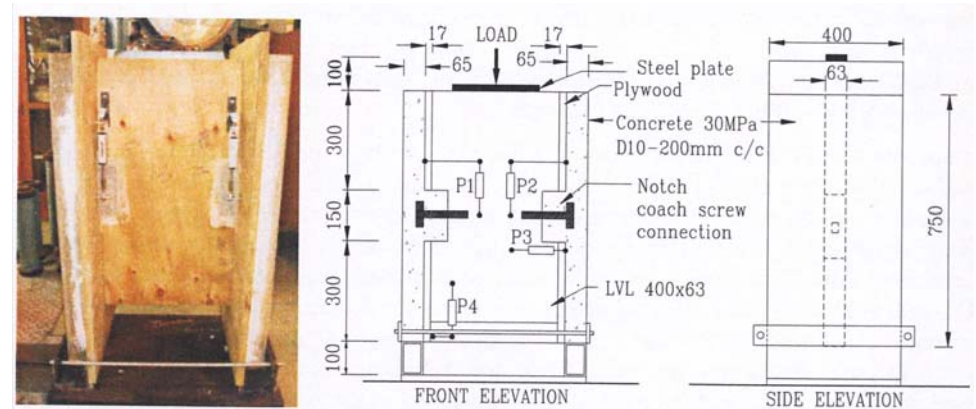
Symmetrical push-out test set-up (dimensions in mm)
